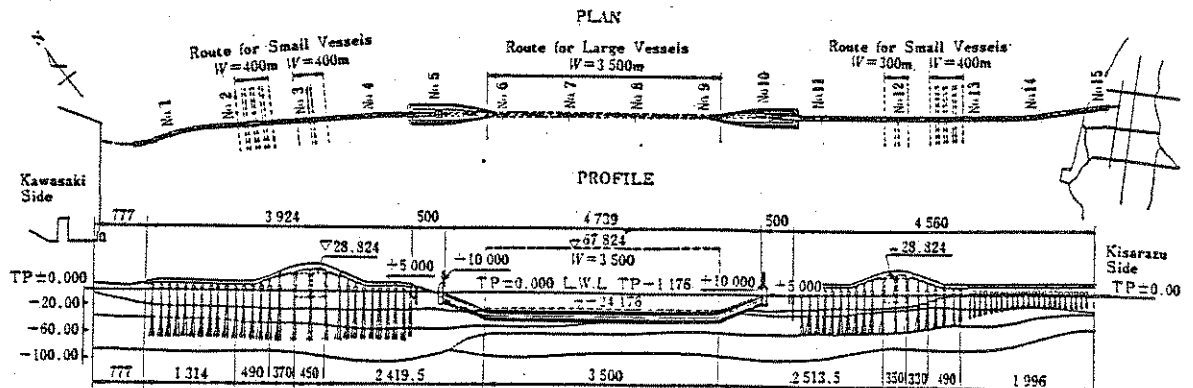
General View of Tokyo Bay Crossing Bridge & Tunnel
